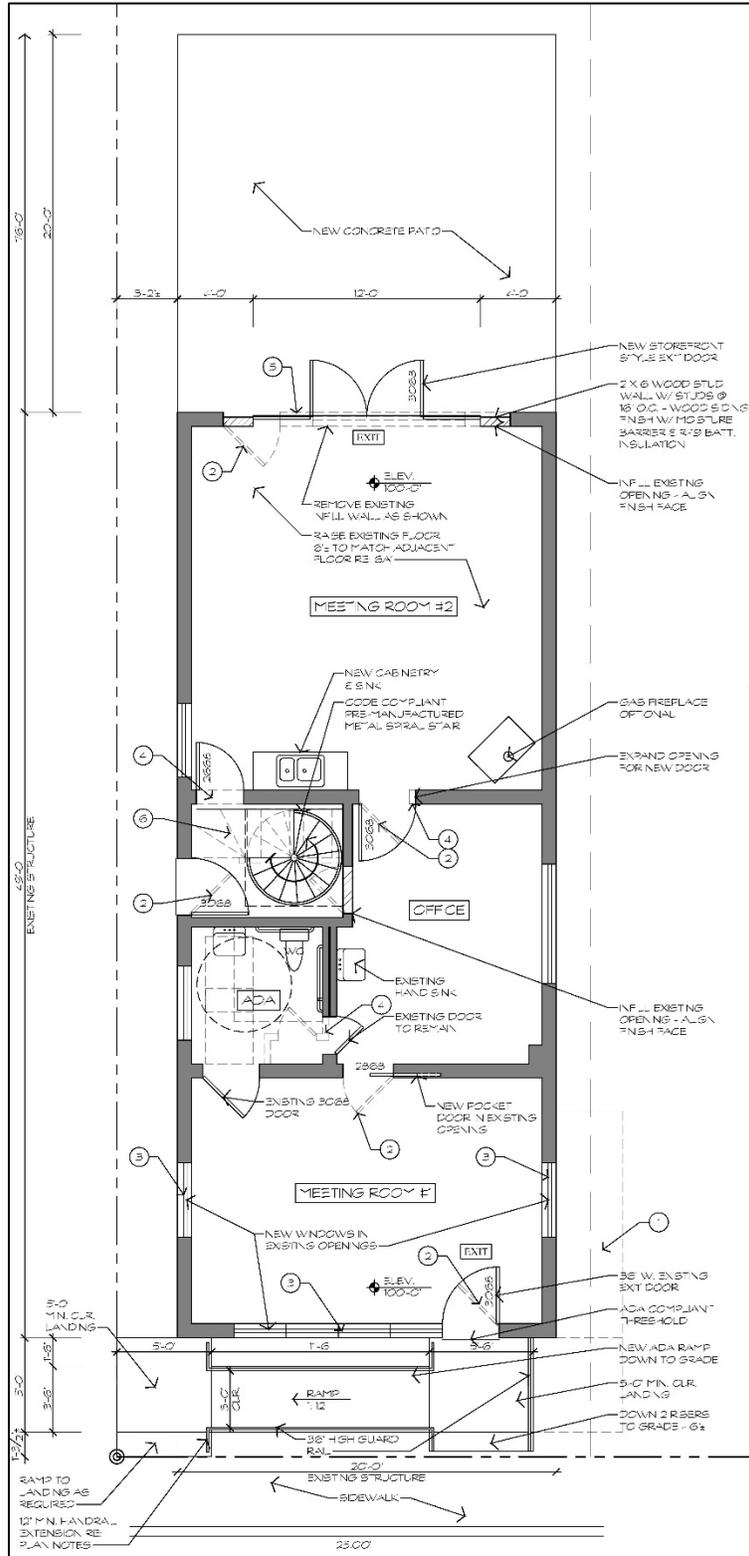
This 2018 construction drawing prepared for the remodeling and reuse of the building shows the interior floorplan. East Main Street is at the bottom of the drawing. The partial basement is only under the center part of the building. SOURCE: Sarah Weddington Architectural Services, The Ranger Station Renovation, construction drawing, January 12, 2018.
